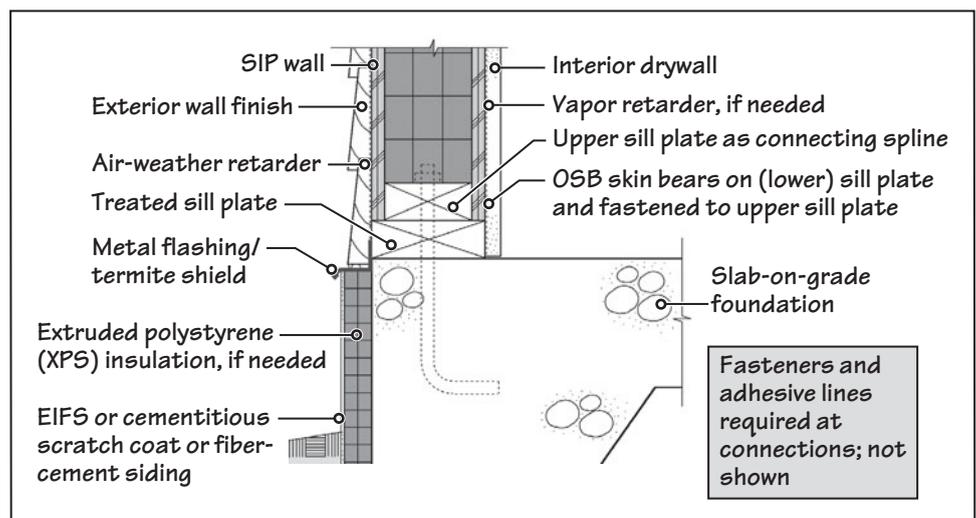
Typical detail of the anchorage of structural insulated wall panels to a slab-on-grade foundation. This detail is keyed to Figure 17.4.
